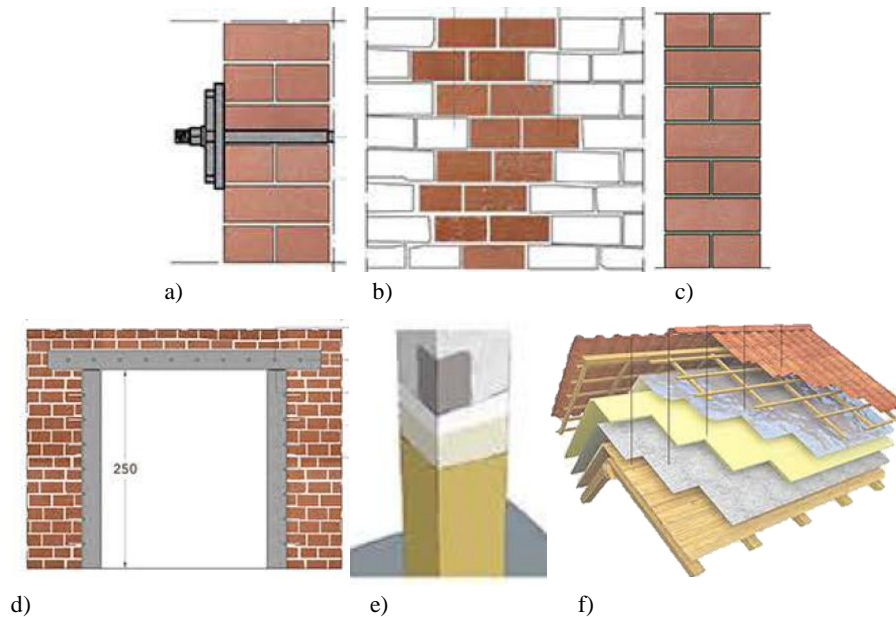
Schematic representation of planned retrofitting operations: (a) Insertion of metal chain; (b) “Scuci and cuci” technique; (c) Re-styling of joints; (d) Steel frame around door; (e) Reinforcement of thereinforced concrete pillar; (f) New roof.
